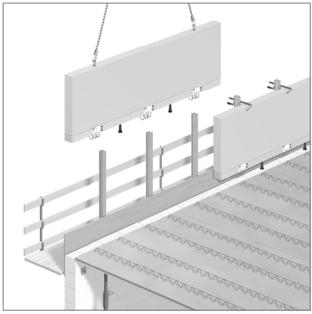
Schöck Isokorb® XT type A with Combar® FT erection support: Edge distance and minimum bond length in the prefabricated parapet
